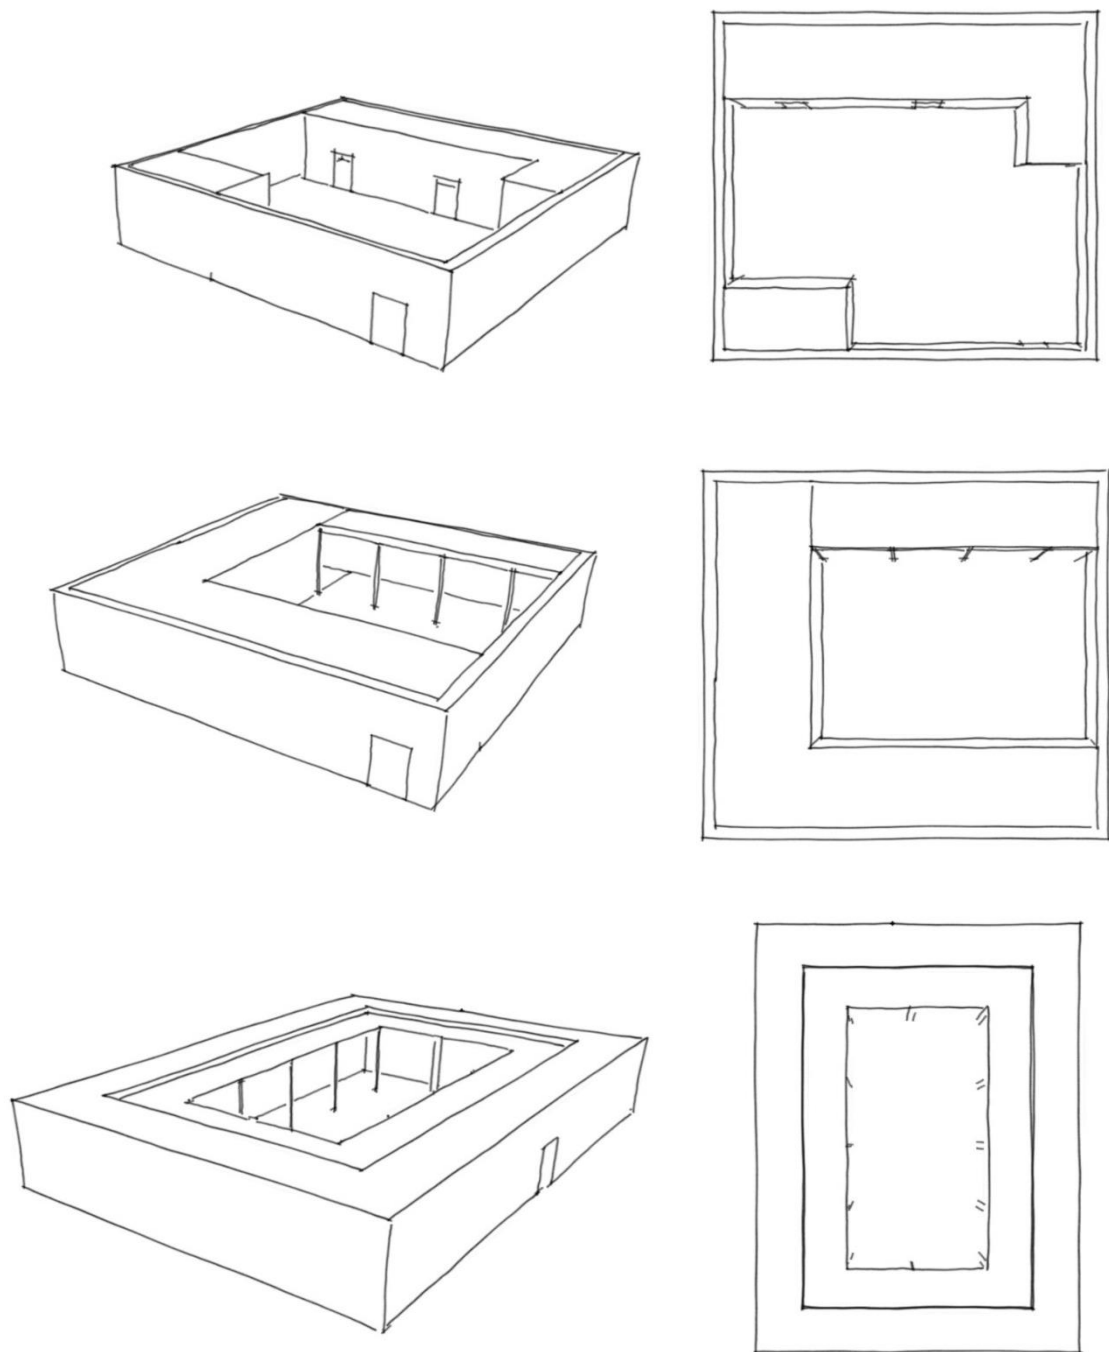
Plans and Perspective drawings of a traditional house in Sharjah (Source: Author, 2020)
